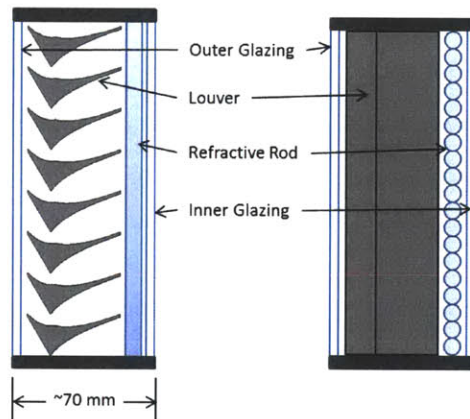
Window Unit Section View (Left) and Plan View (Right)
